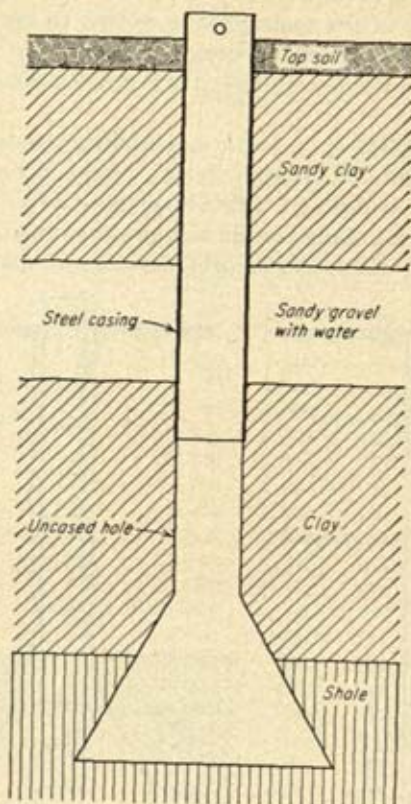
Steel casing used to permit footing to be drilled through unstable soil.
